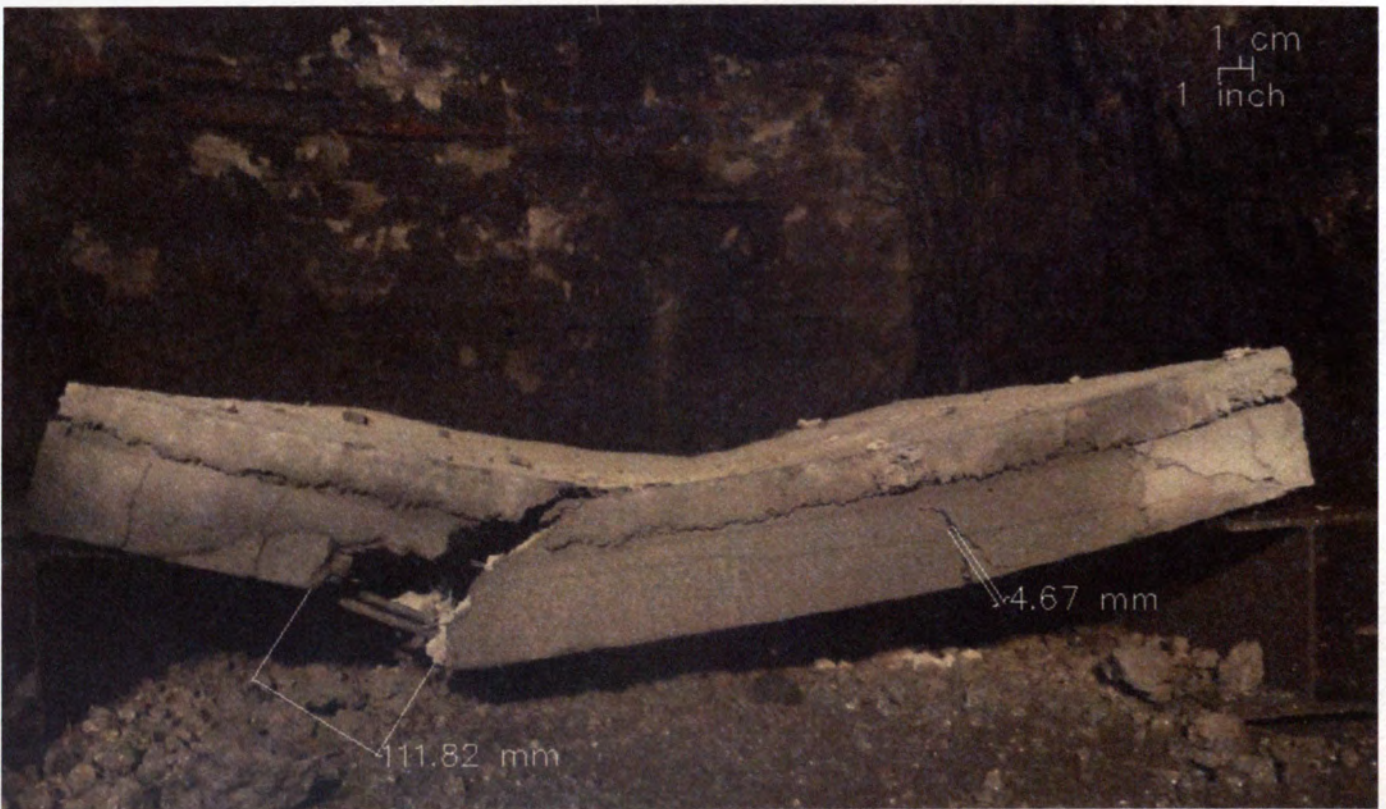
Flexural and Shear Cracks in the Front Face of 1-H, 2nd Event
